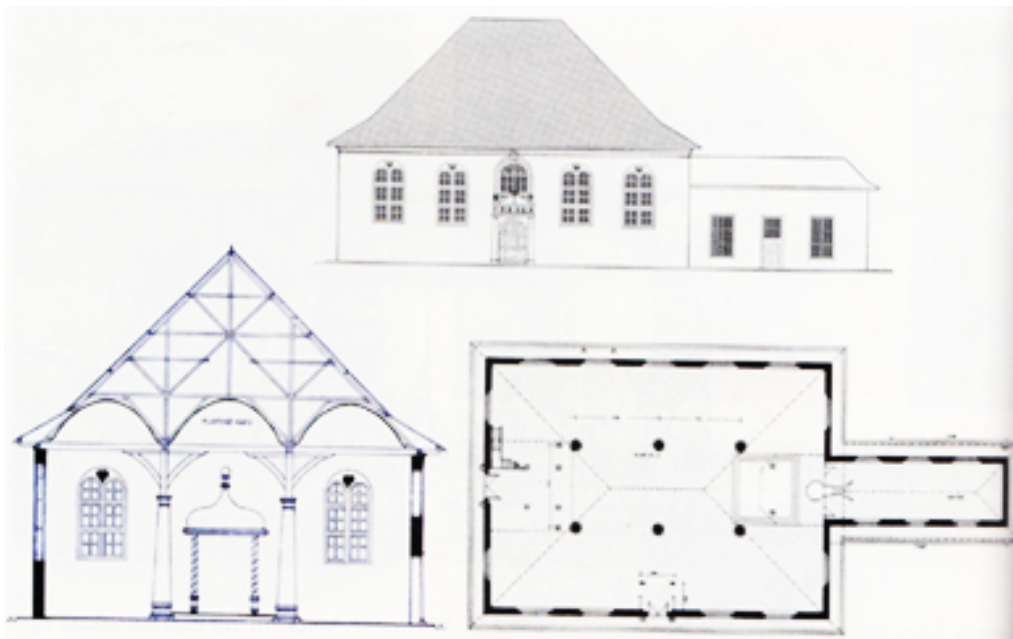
Sketch, facade, and a cross-sectional the Jakarta Sion Church (source: Heuken,2009)
